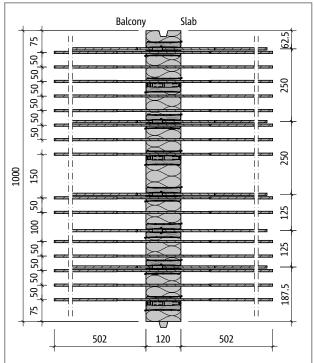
Schöck Isokorb[®] XT type K-M6: Product plan view
